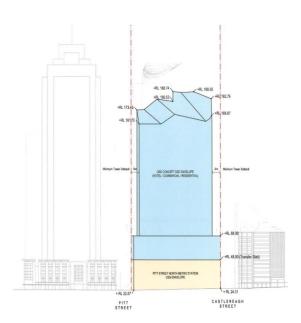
Pitt Street North Concept SSD DA - Envelope - East Elevation (Source: SSD 8875 Concept Stamped Plans)
